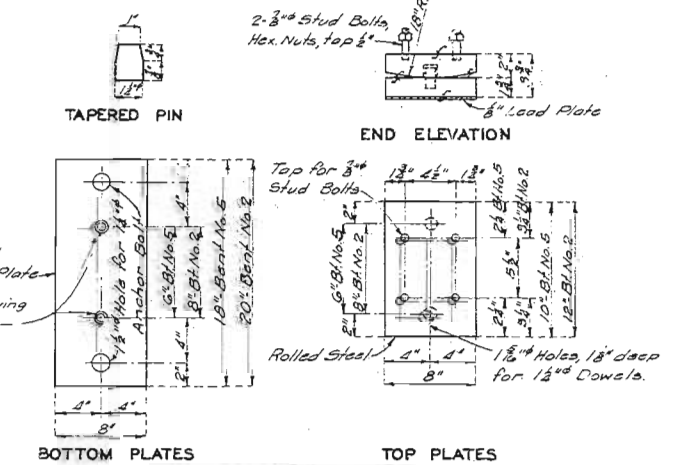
DETAILS OF FIXED SHOES FOR TRUSS SPAN
